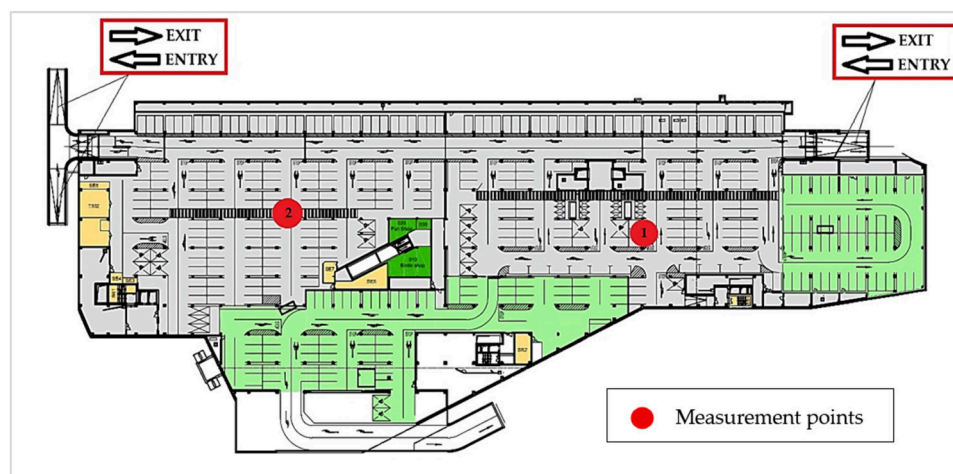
Layout of the underground parking facility showing the locations of measurement points MP1 and MP2.
